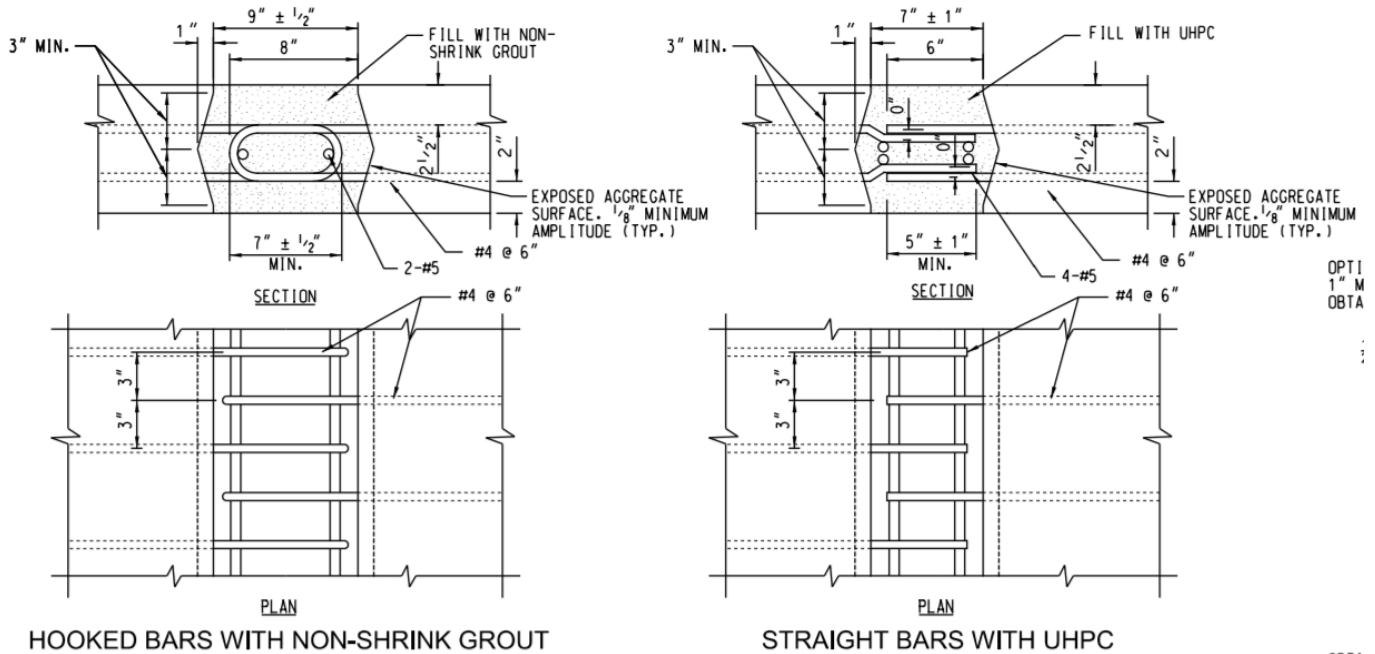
NEXT D Joint Details for Non-shrink Grout and UHPC (Culmo Email September 22, 2016)
